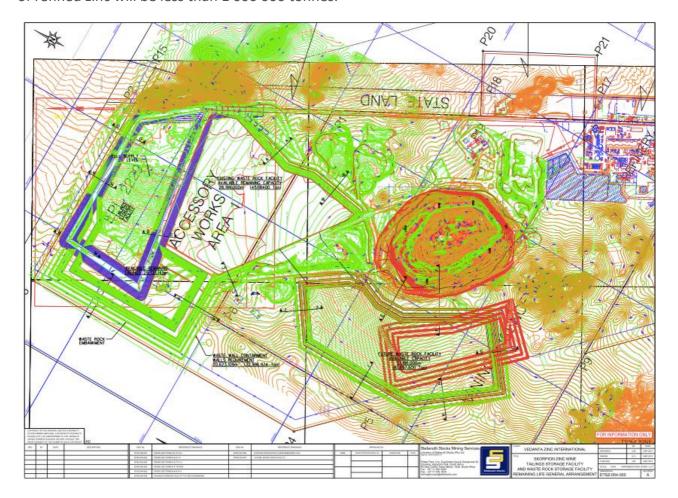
DESIGN OF WASTE ROCK DUMP AND TAILINGS STORGAE FACILITY
